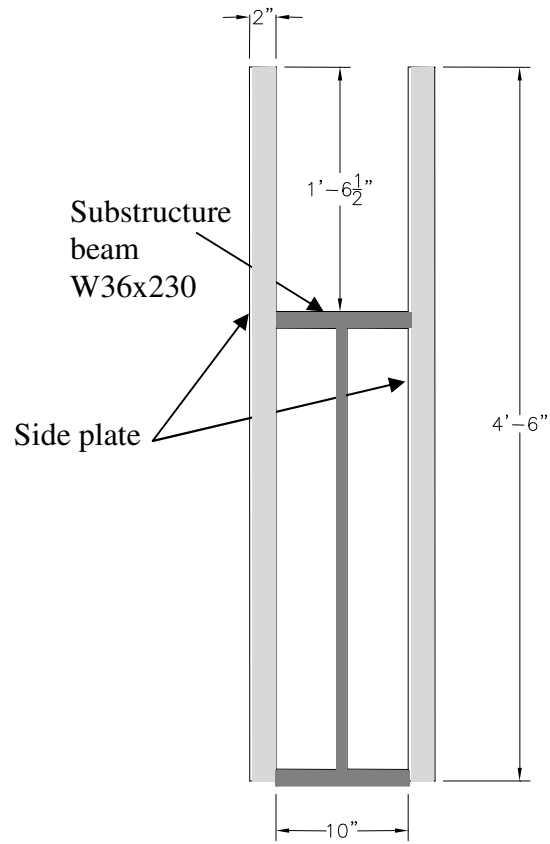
Section through foundation beam and side plates (see Figure 8.12)
